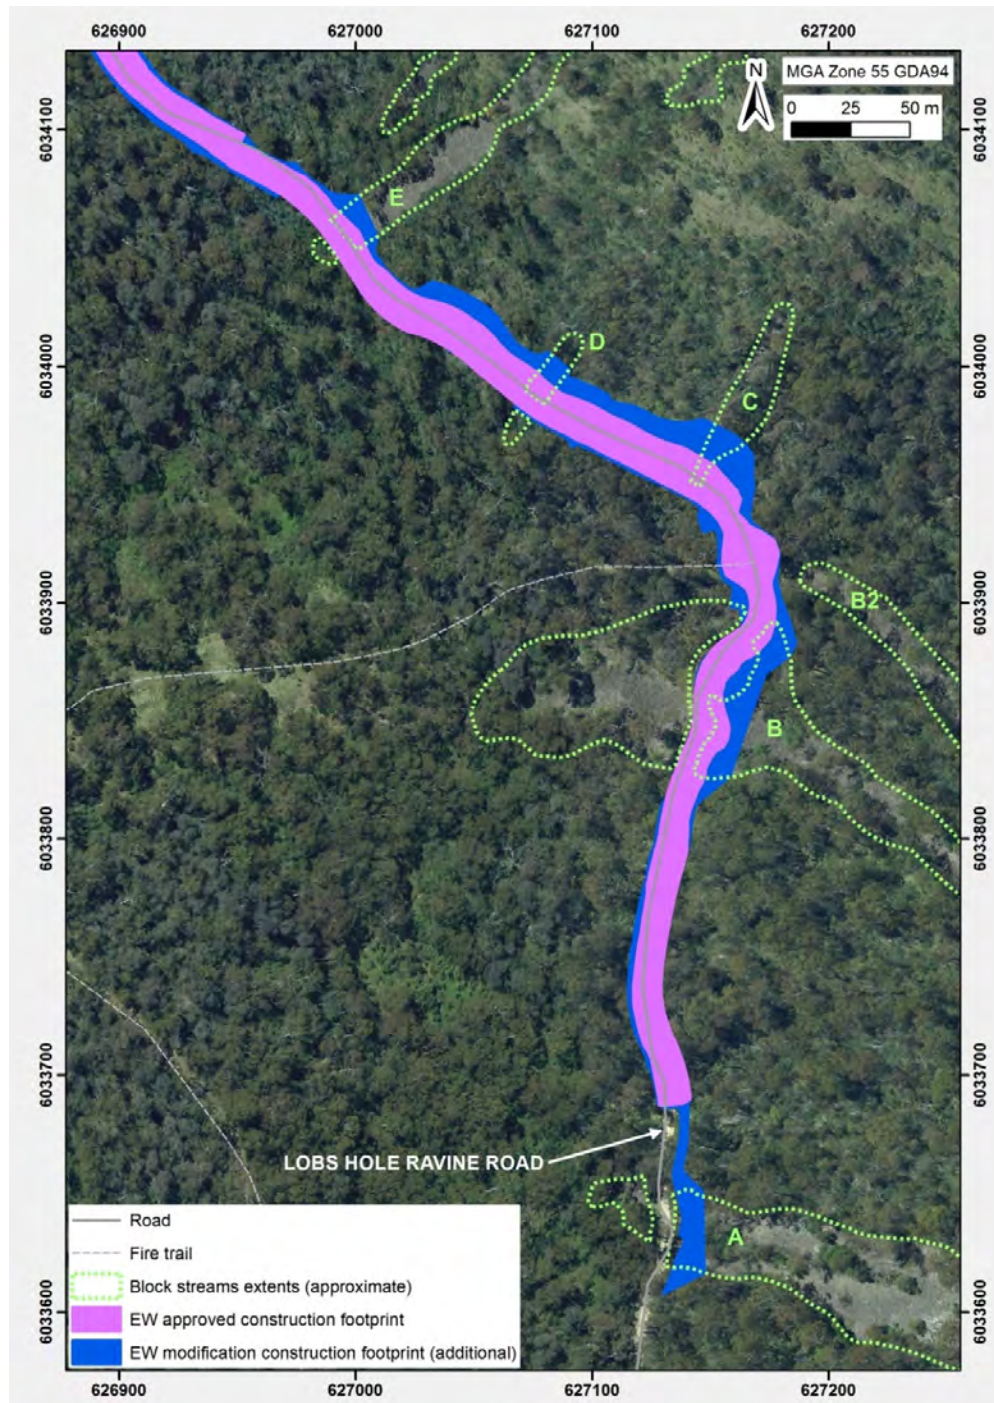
Aerial view of the Ravine block streams showing the approved EW construction footprint and proposed Modification 1 additions to that footprint along Lobs Hole Ravine Road.
